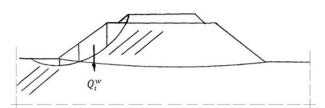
Cross-section profile embankment on weak soils with the calculation diagram to determine stability coefficient Ksw
